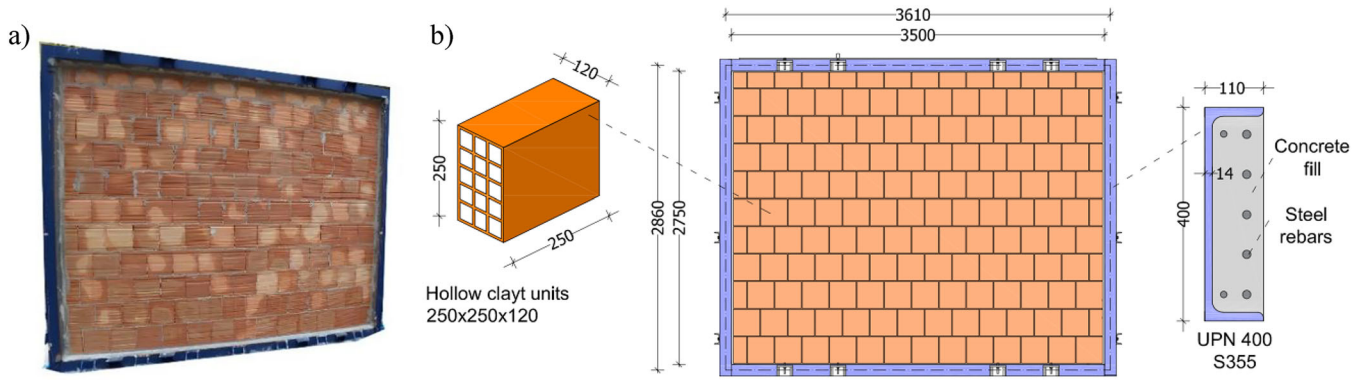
| Details of the considered specimens: (a) View of a specimen; (b) Geometric details. [Dimensions in mm].
